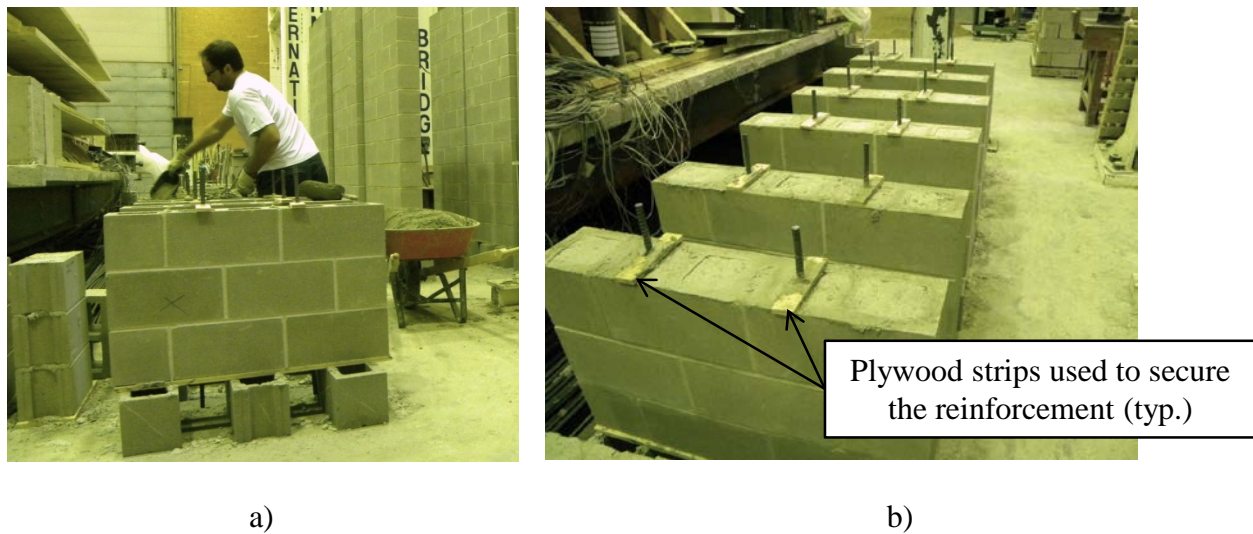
Grouting of the pullout specimens: a) grout placement, and b) completed pullout specimens.
